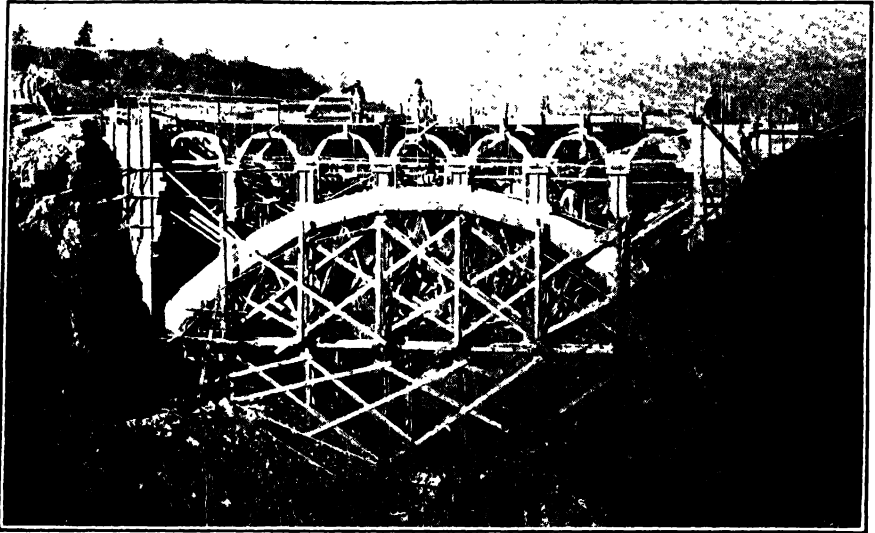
Trestle centering for 75-ft. arch span—Dry Canyon Arch—Wasco County, Oregon.
